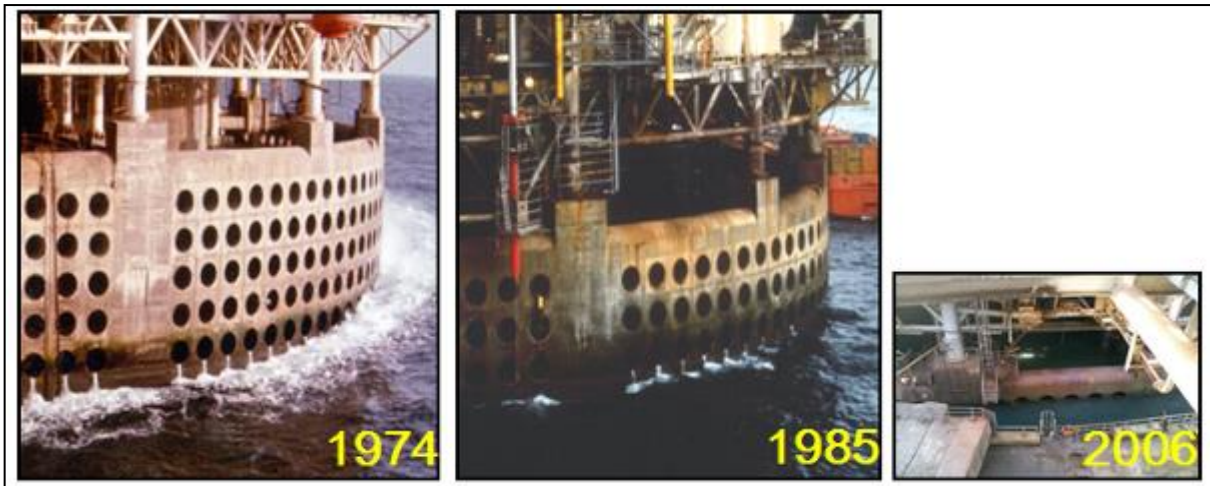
Subsidence of the concrete protective wall around the storage tank (COPNO Internal).
